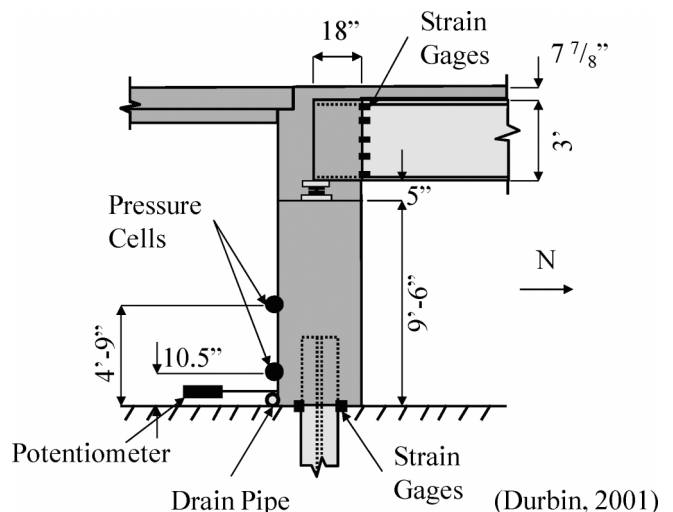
Cross-section A-A of I-65 over SR-25 Instrumentation Plan
